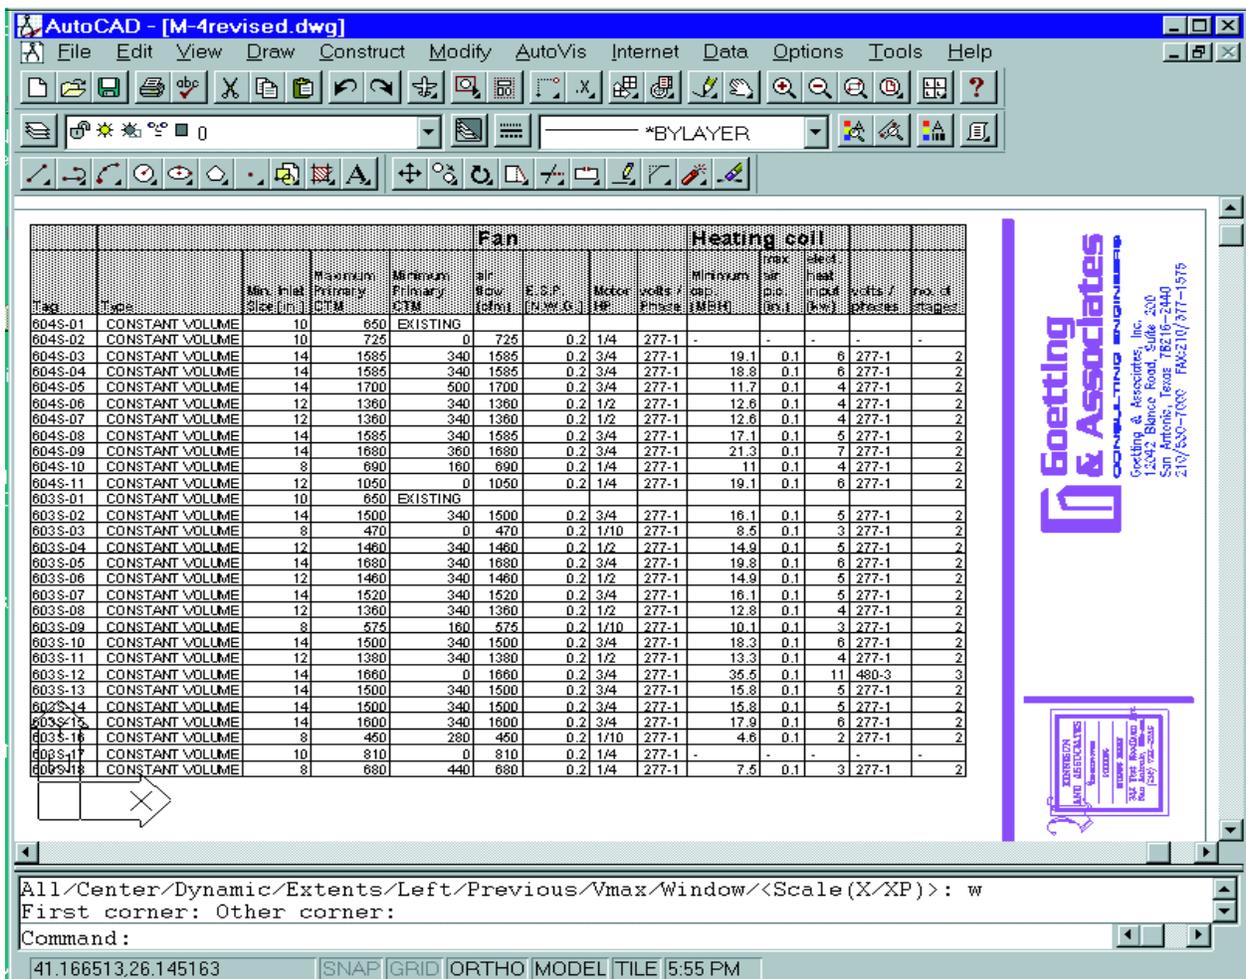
Using OLE to integrate spreadsheets and CAD drawings.
